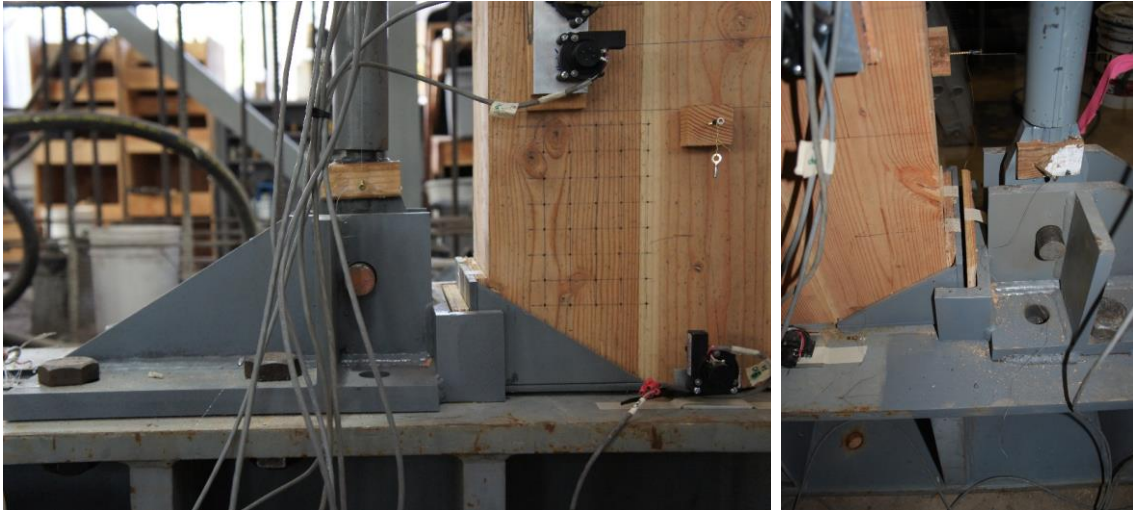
Base corner solution shear key, working also as bottom attachment of the axial dissipater
